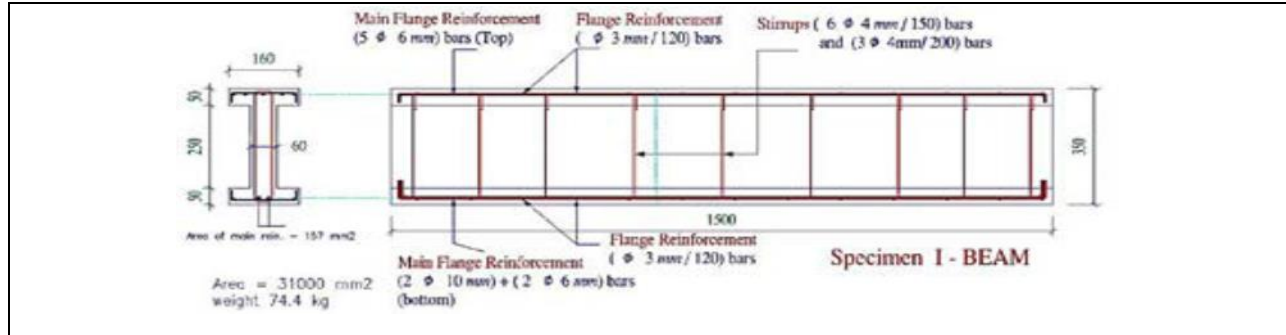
15: Geometry and Sectional Dimensions of the I-section Reinforced Concrete Beam[26]
